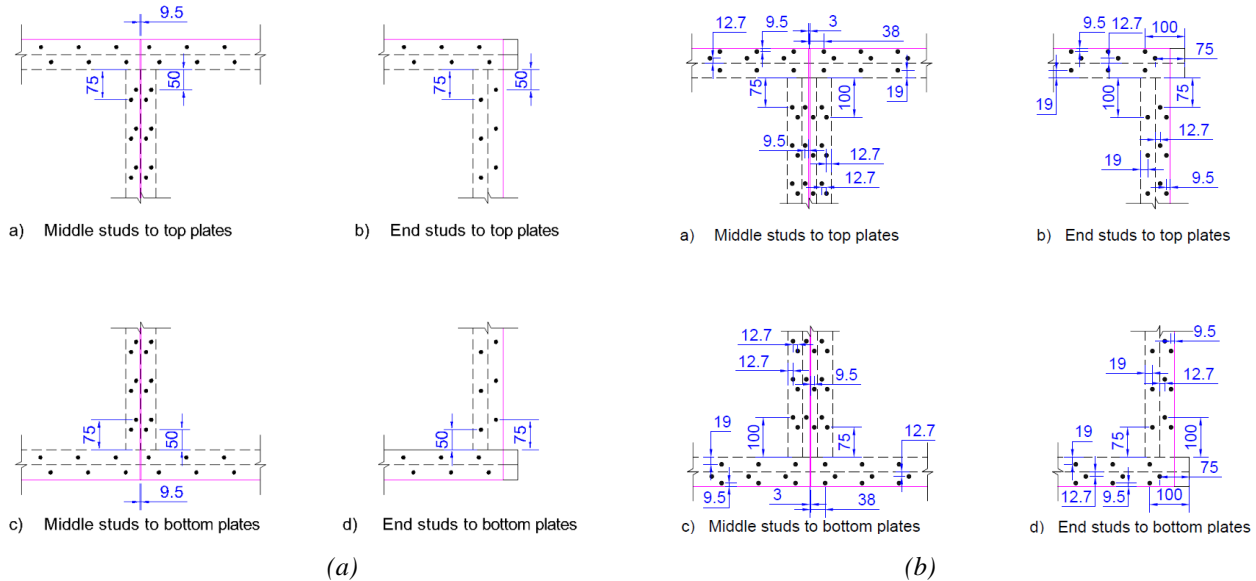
Nailing patterns (mm): (a) Nailing pattern of two rows of nails (2020) [13], (b) Nailing pattern of three rows of nails (2021) [14].
